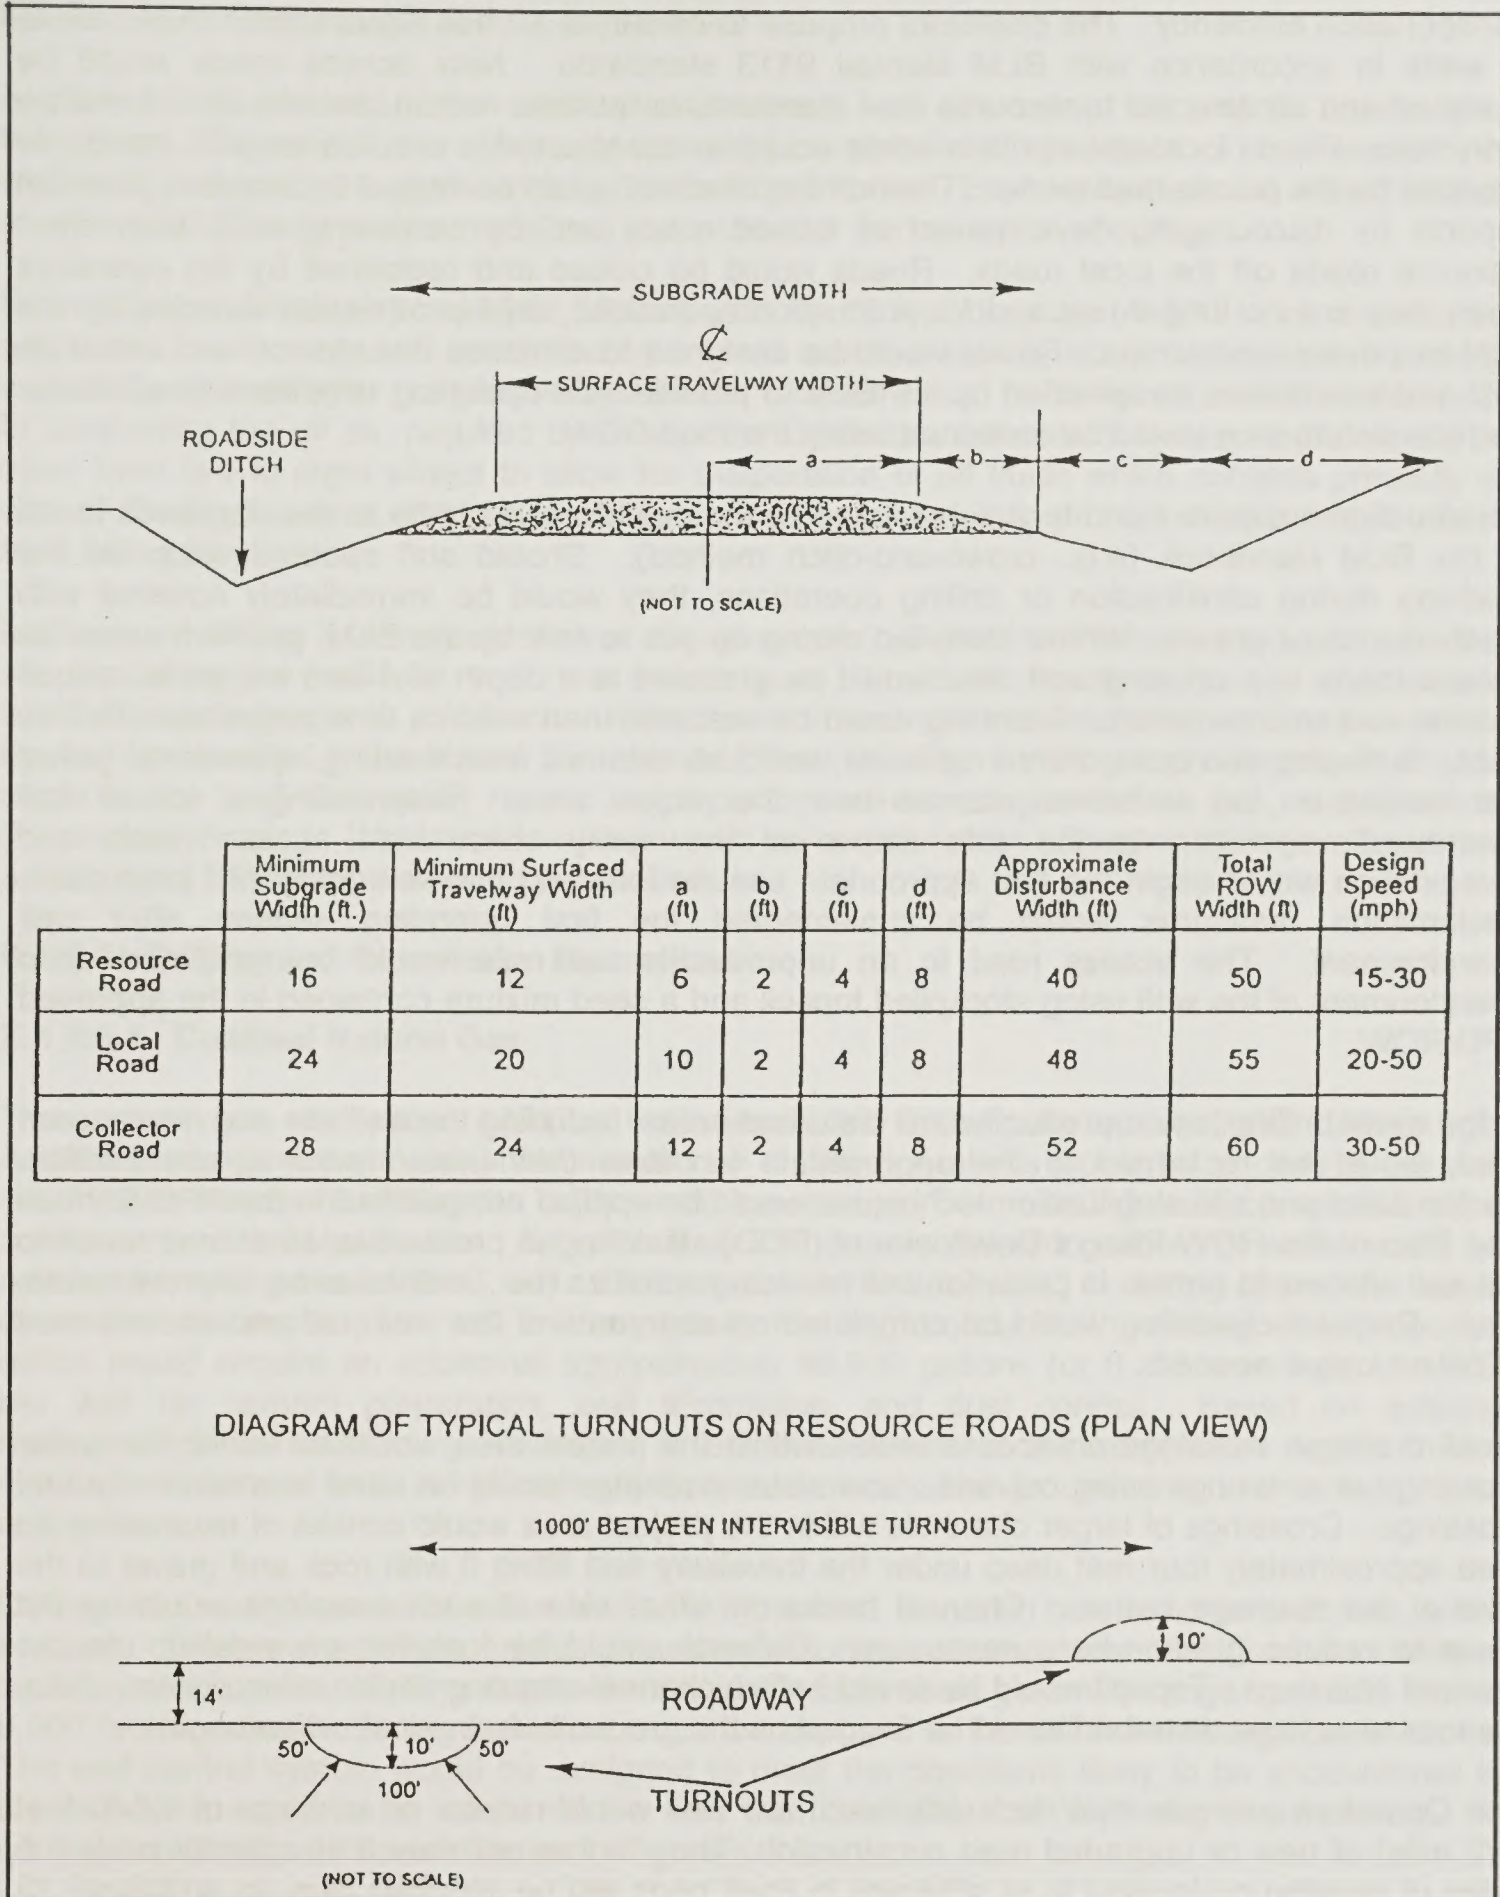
Typical Roadway Cross-Section with Width Specifications
